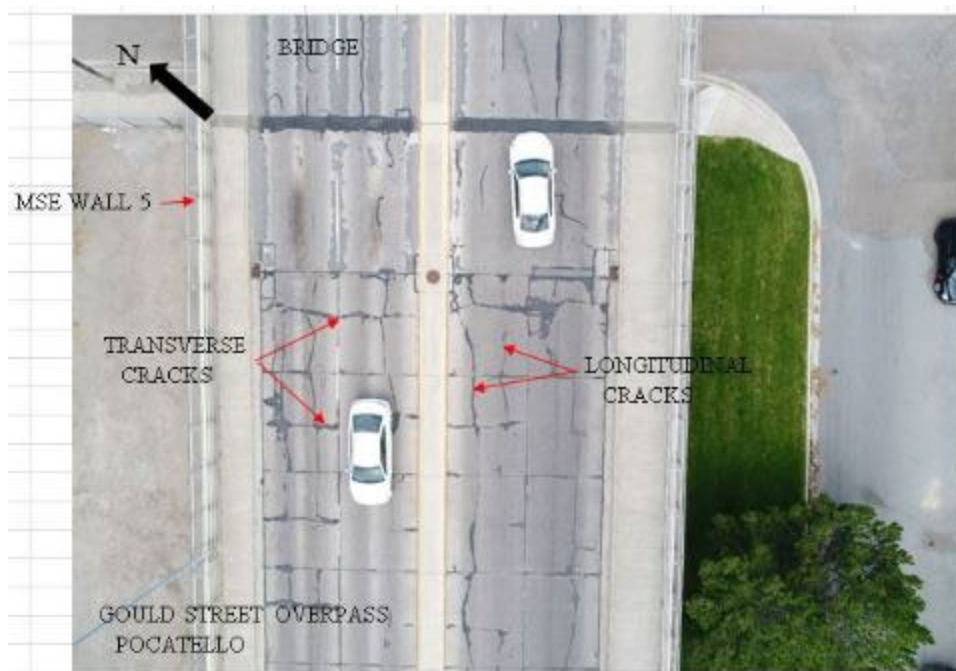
sUAV Photo of Pavement Cracks, Gould Street Overpass, Wall 5
